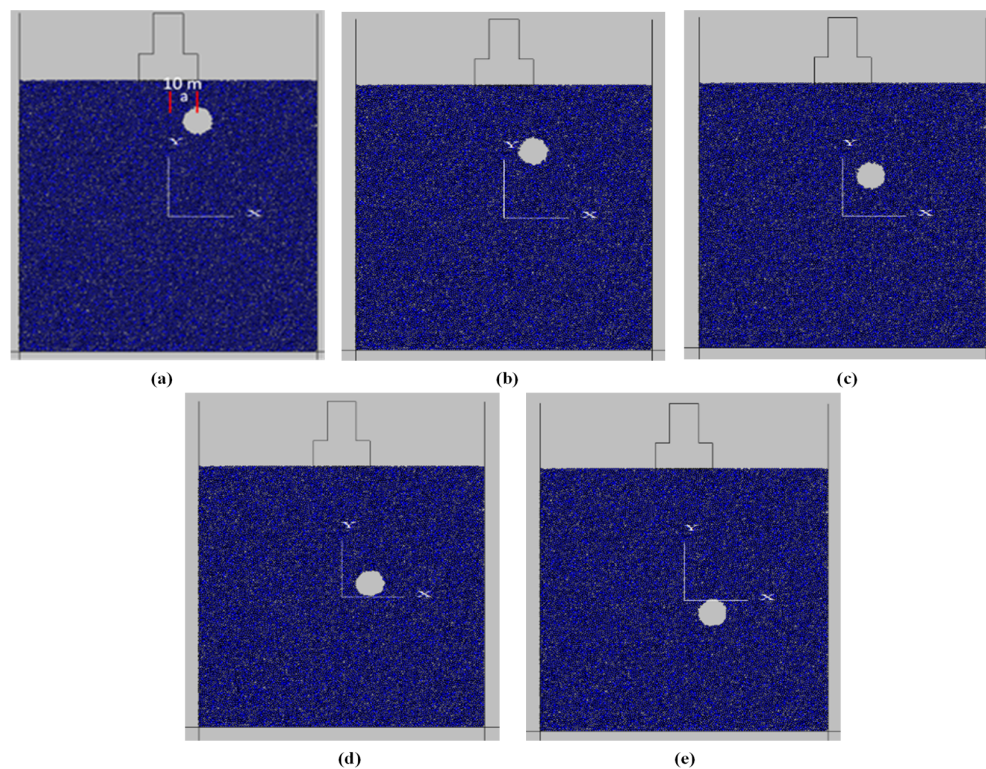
Tunnel was situated below the surface foundation at a vertical distance of a) 15 m, b) 25 m, c) 35 m, d) 45 m, and e) 55 m; the horizontal distance between the tunnel center and the foundation was 10 m.
